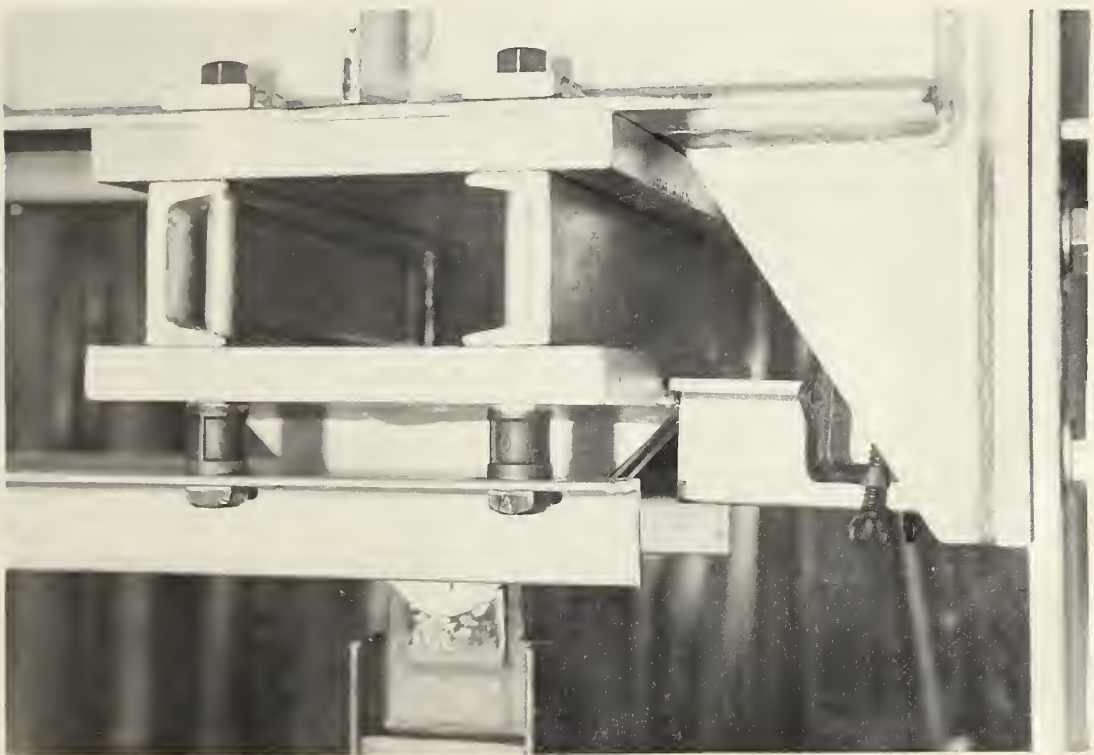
HORIZONTAL REACTION ASSEMBLY - RIGHT SUPPORT
